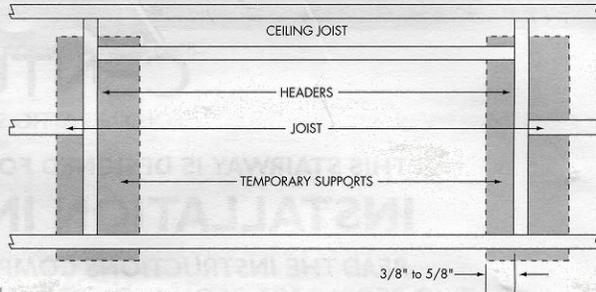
FRAMED OPENING WITH TEMPORARY SUPPORT SLATS READY TO RECEIVE STAIRS
